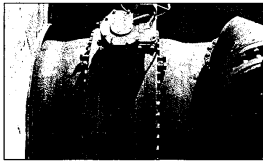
Restrained gasketed threaded bell and spigot O-ring joint
